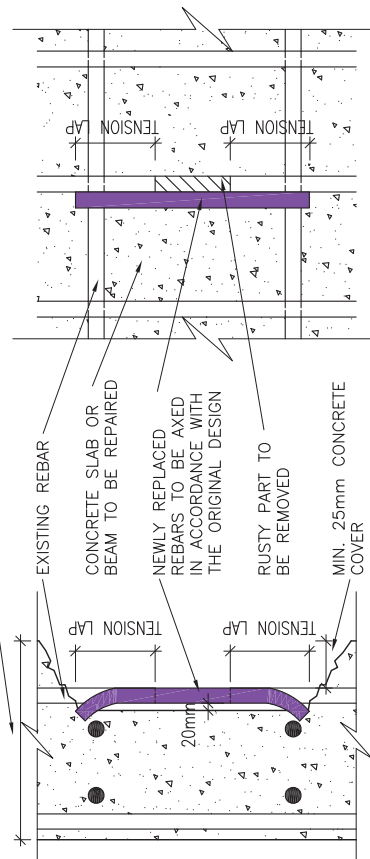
DETAIL A – REPAIRING OF DETERIORATED REBAR AT R.C. WALL
